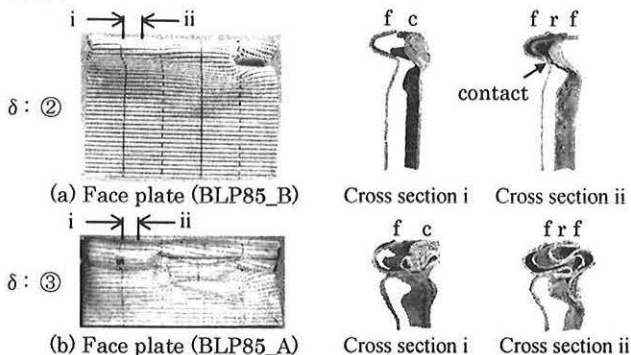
Deformation of face plate and cross section of the hollow extrusion
